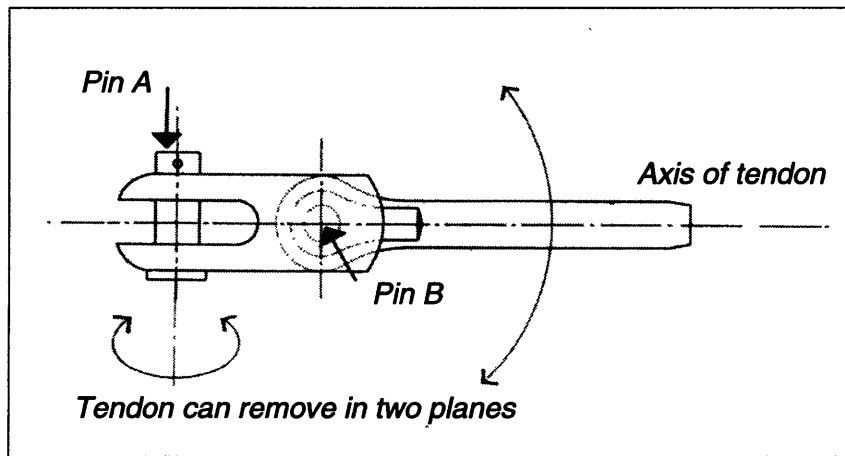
A toggle fork that allows movement to occur in two planes without transmitting bending stresses to the cable [16].
